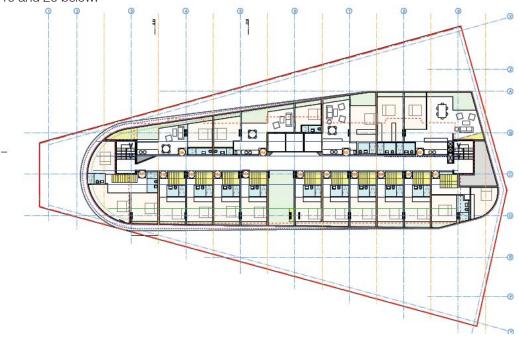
Durbach Block Jaggers - Additional Information: Cross Over Apartment Plans - Typical Apartment Lower Level Plan
